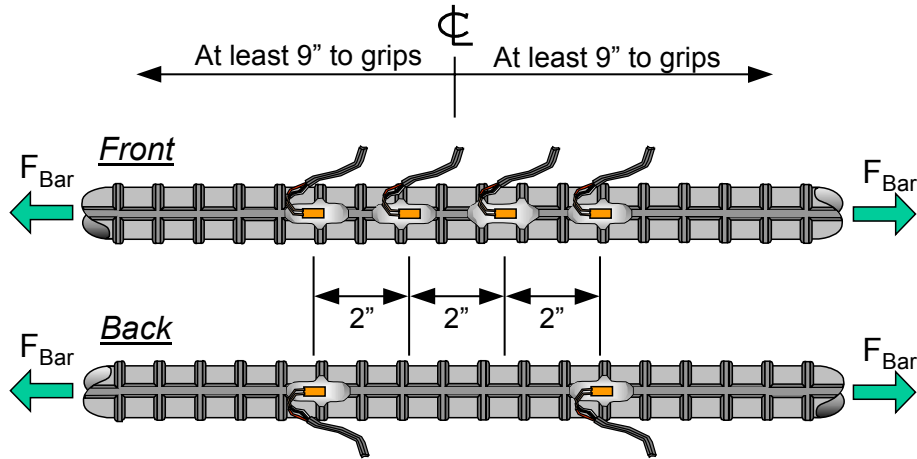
Layout of strain gages for #8 and #11 tensile specimens
